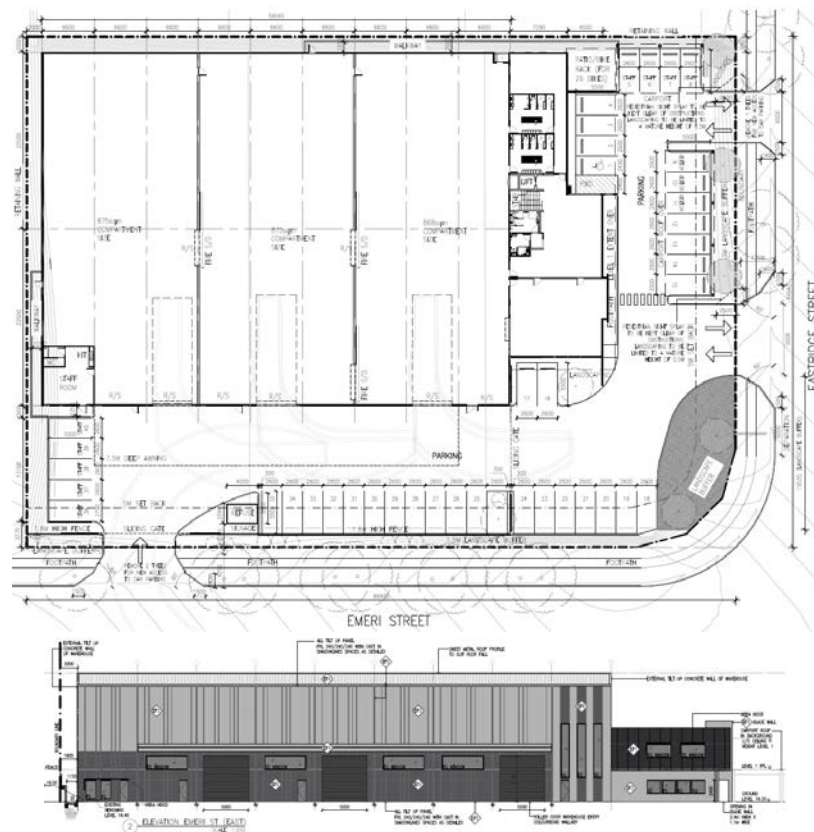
Proposed site plan and elevation (GDP file, 2022)
